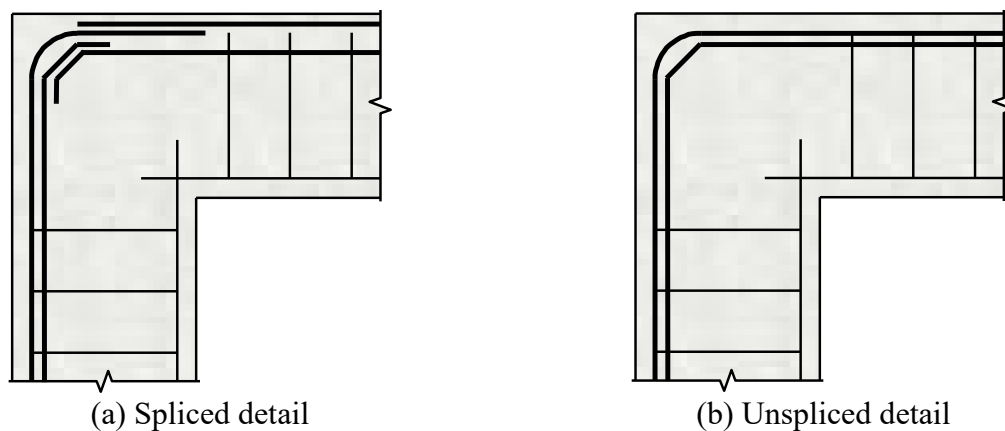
Details with and without splices (adapted from Plos⁹)
